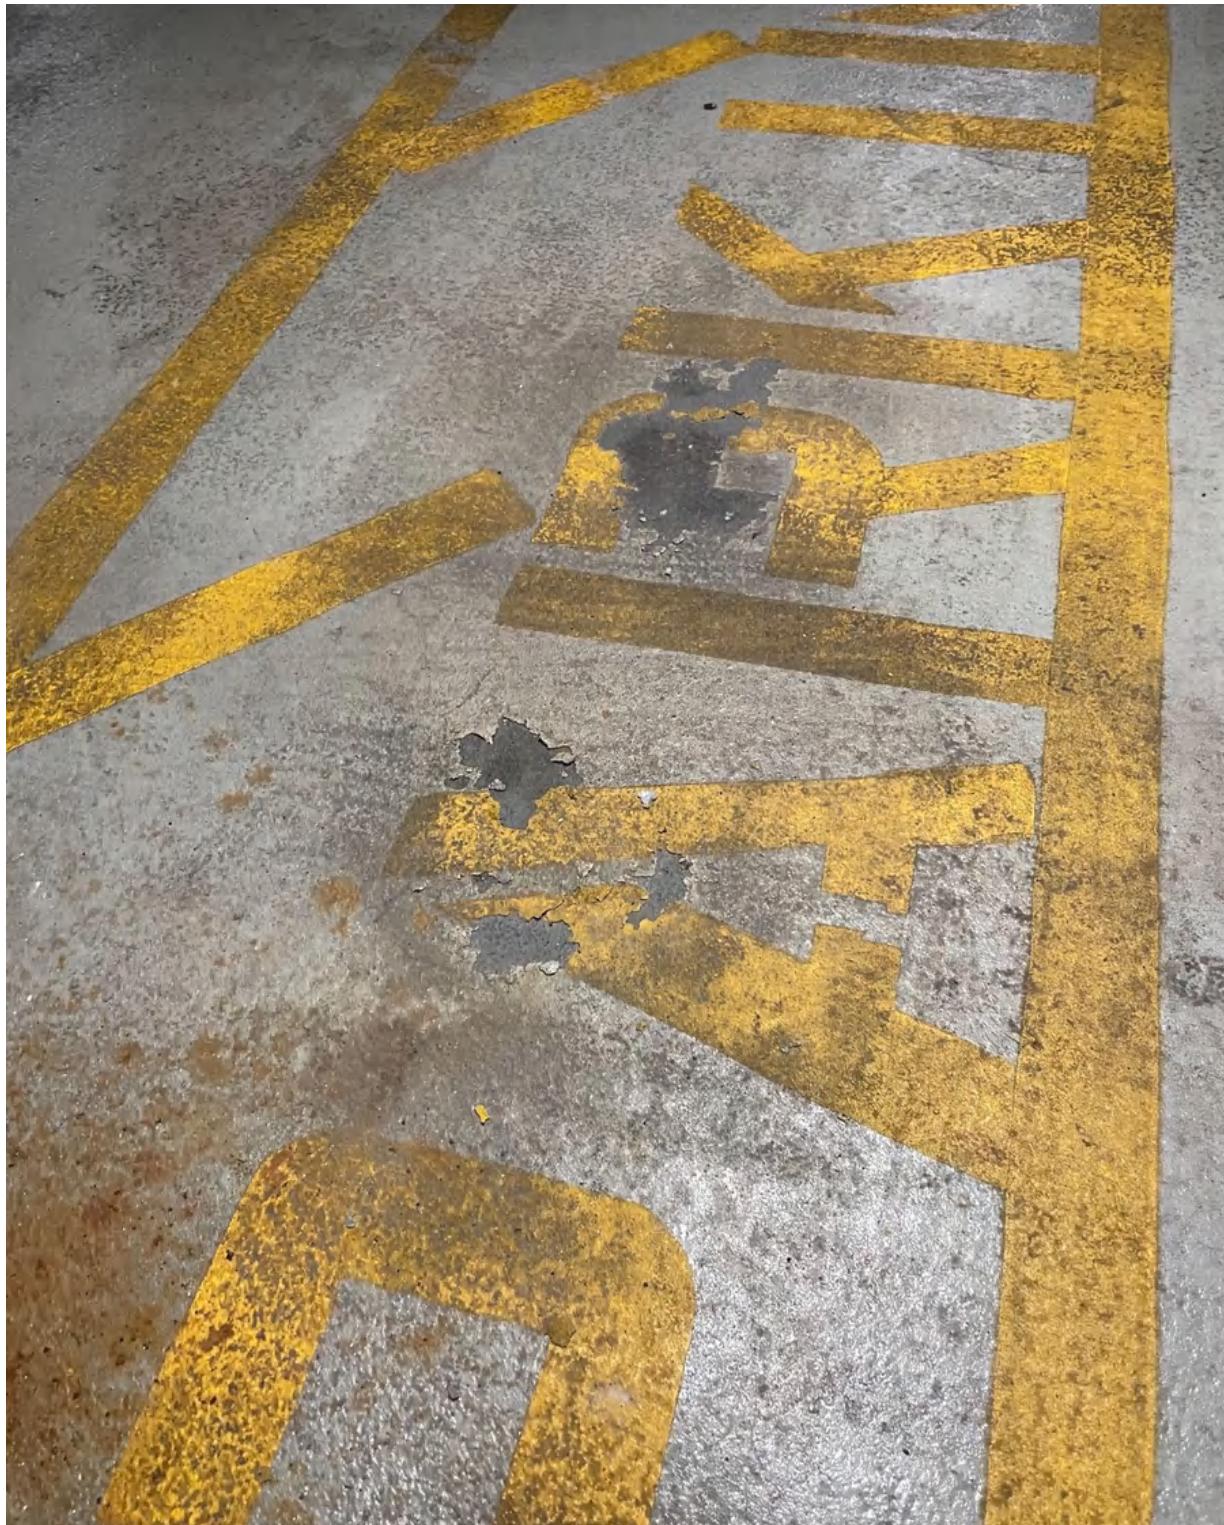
worn out/delaminated urethane traffic coating at upper level garage parking stall
